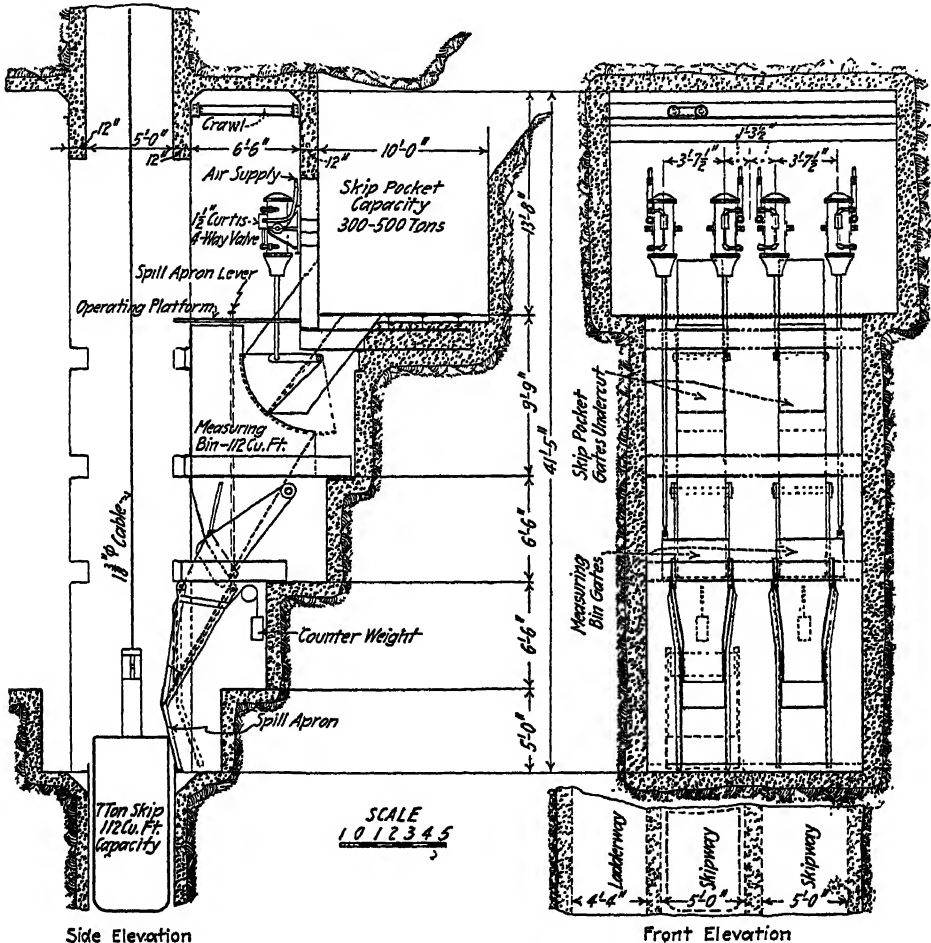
LOADING POCKET, NO. 5 SHAFT.
